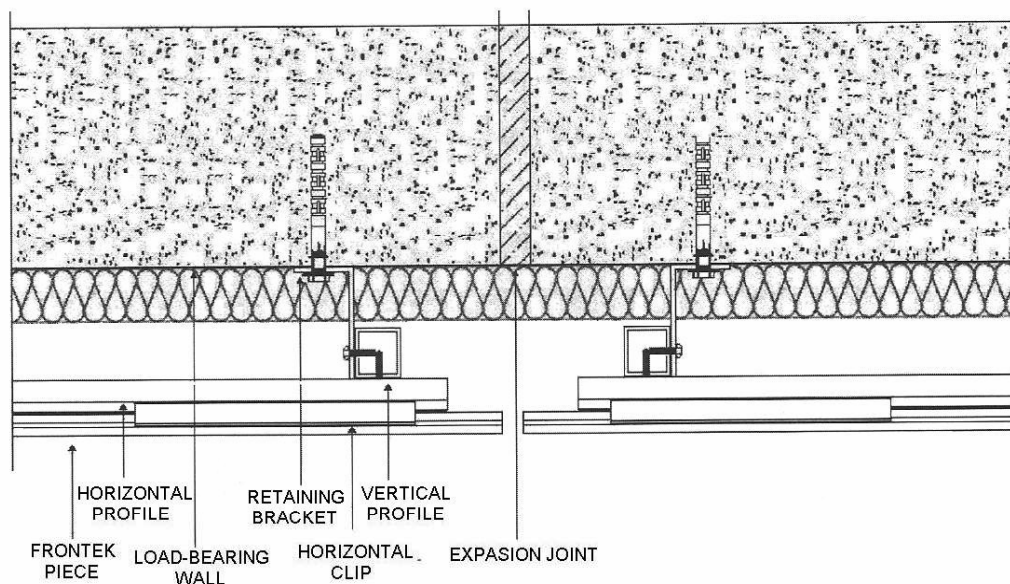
HORIZONTAL EXPANSION JOINT / JOINT BETWEEN HORIZONTAL PROFILES.
